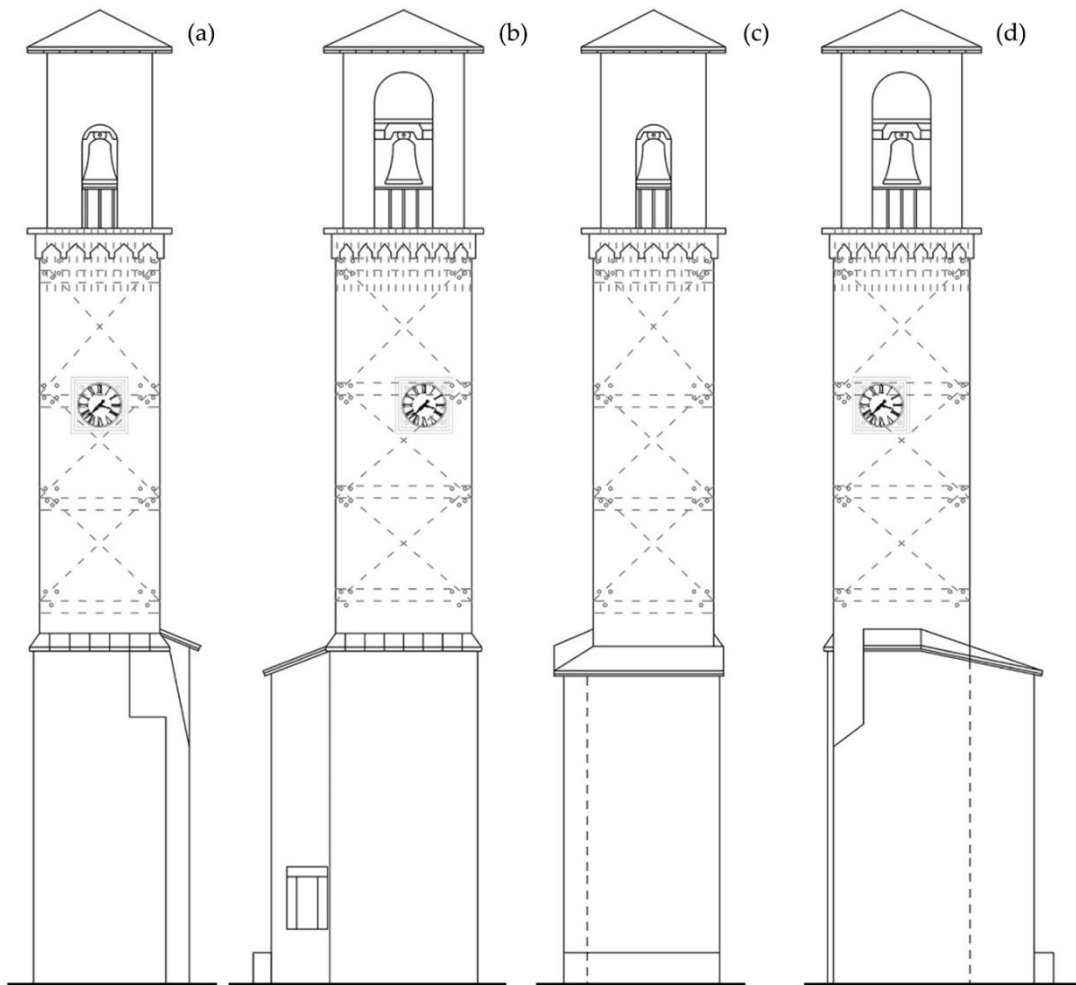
Details of the consolidation works carried out in the 1980: the North (a), West(b), South (c) and East (d) façade.
